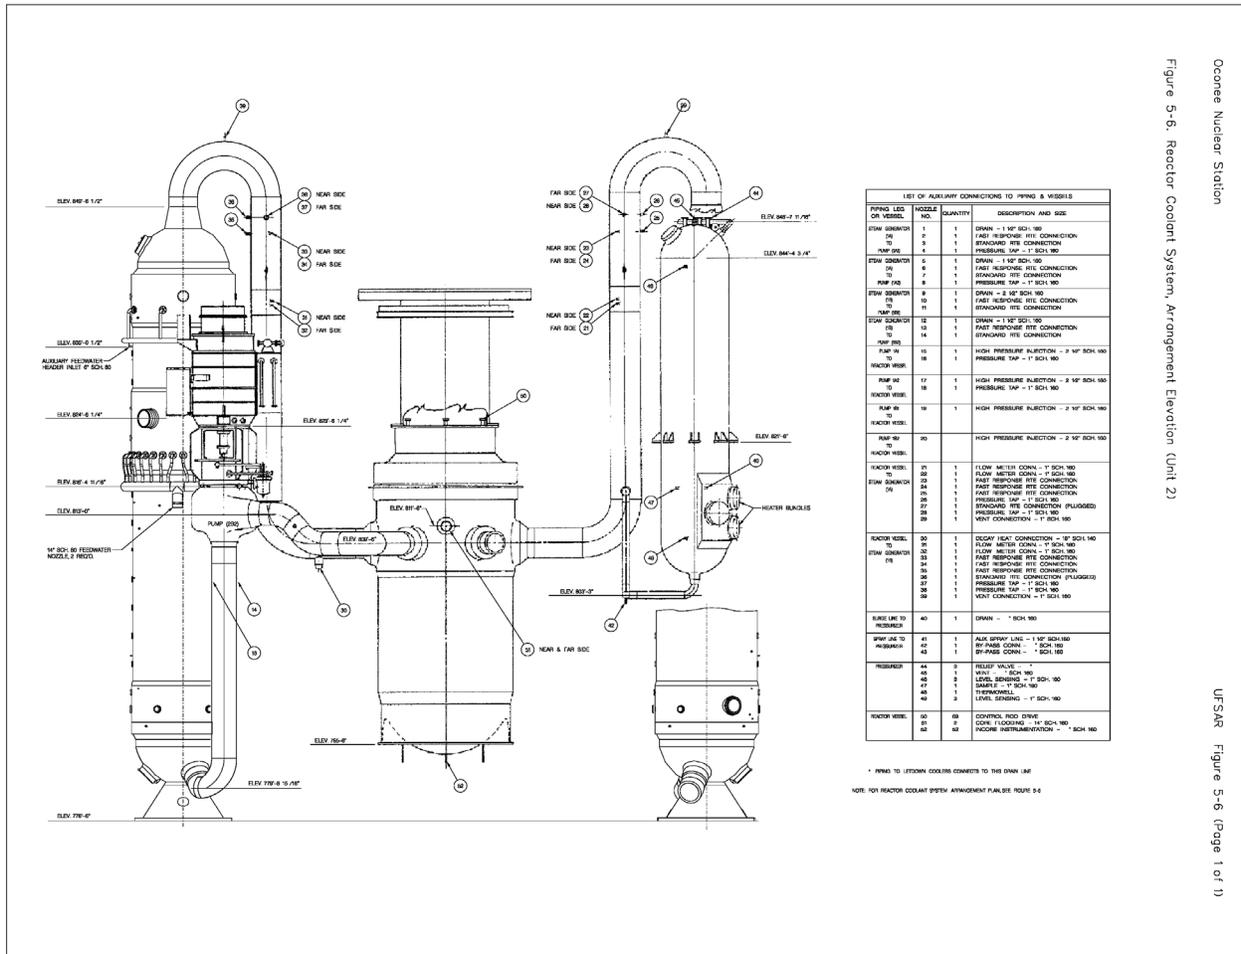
Reactor Coolant System, Arrangement Elevation (Unit 2)
